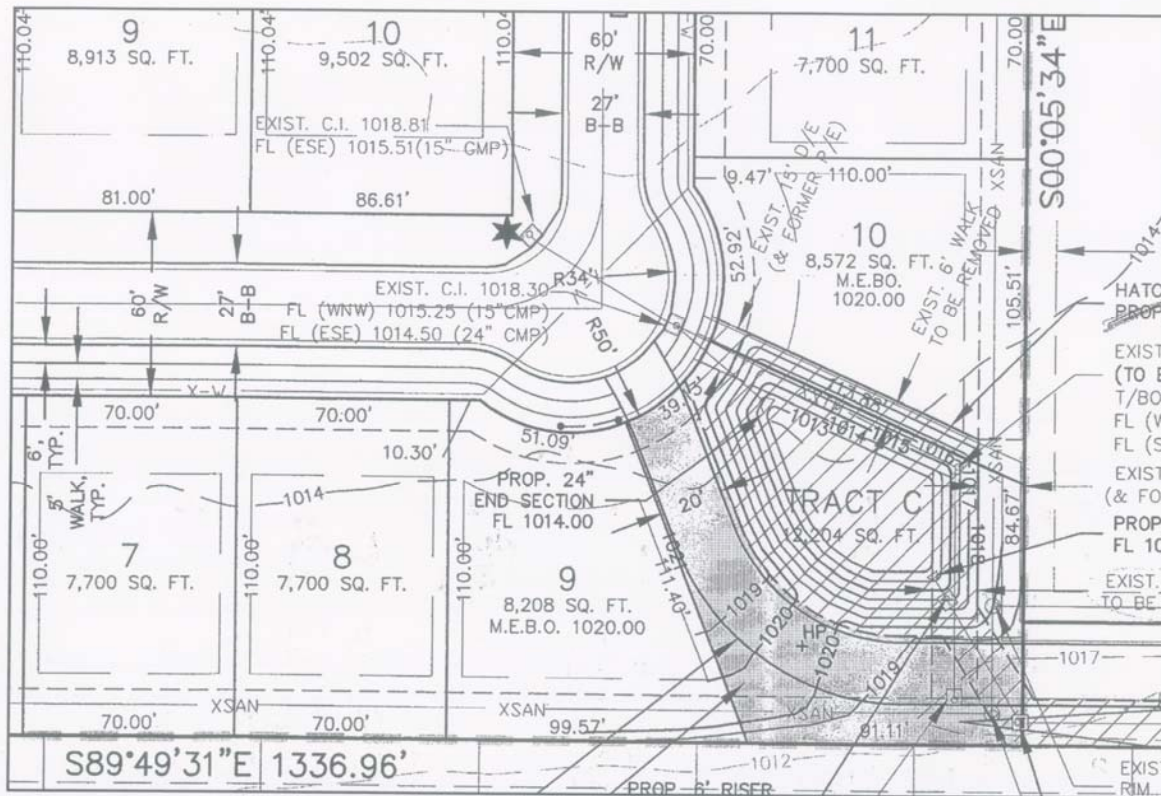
Detail of Maple Leaf Square preliminary plat showing sidewalk on the south side of the street and street right-of-way. Area with narrower right-of-way is marked with a star.
